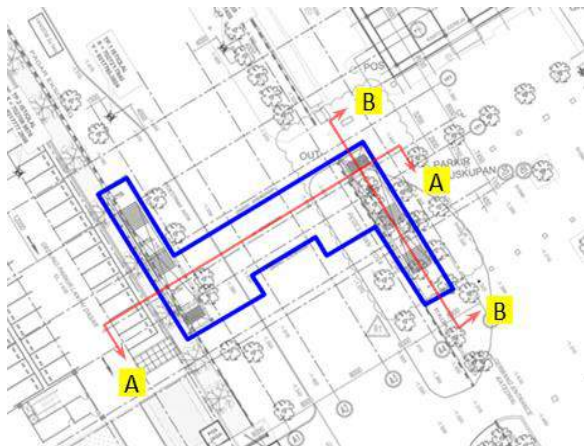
Tunnel Excavation Plan & Diaphragm Wall Plan.
